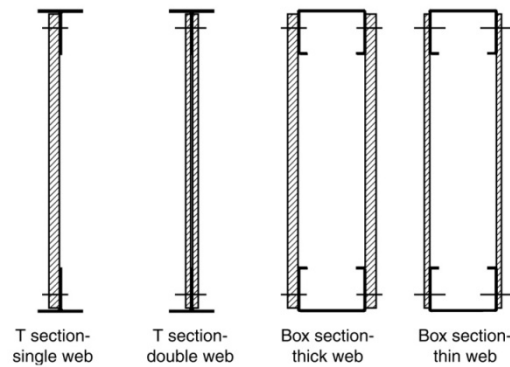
Steel-timber joist configurations using T and C section flanges (107)
